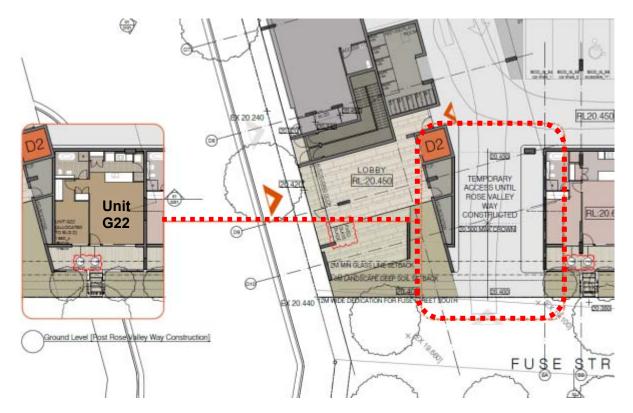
Temporary Fuse Street Driveway at Stage 1 - to be in filled with unit G22 at Stage 2
